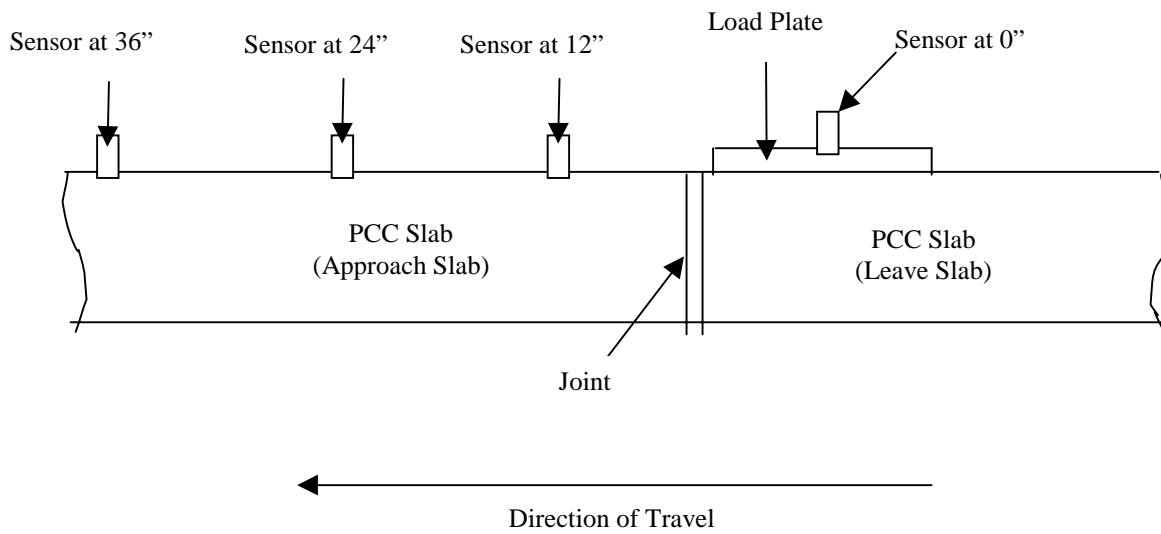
Joint Load Transfer Testing Sensor Spacing ID #3
